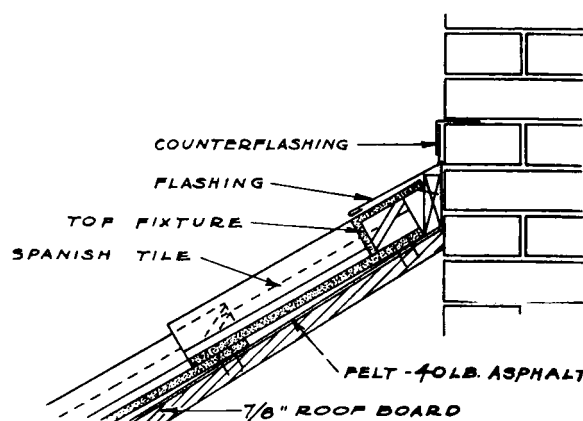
Metal Apron in Brick Wall for Pitch Roof
